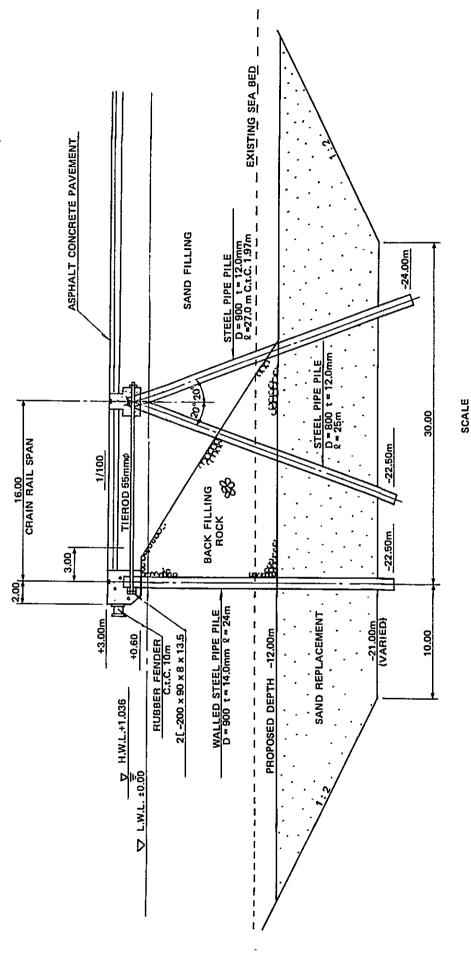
Container Berth Quay Wall (Walled Steel Pipe Pile Type)
